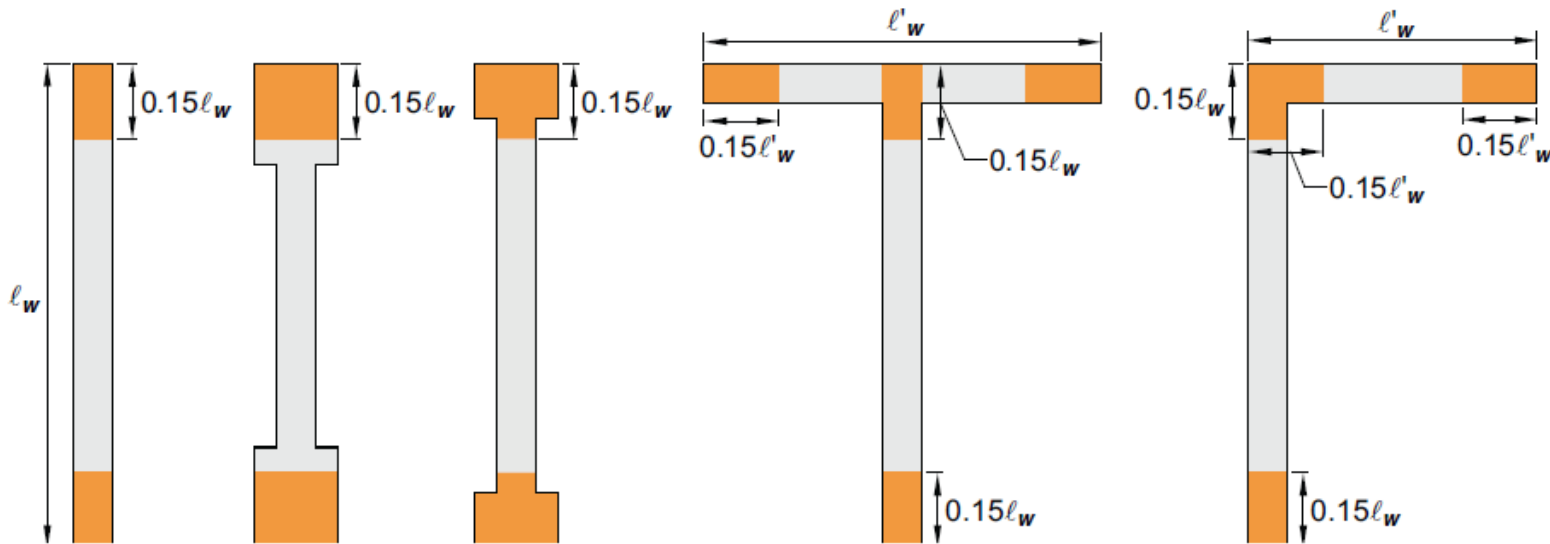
Locations of longitudinal reinforcement required by 18.10.2.4(a) in different configurations of wall sections.
